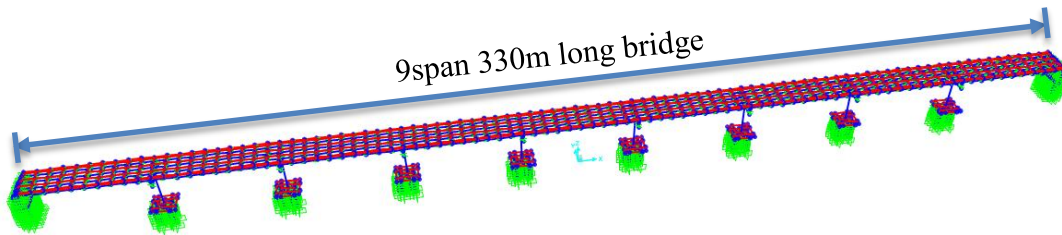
3D bridge model in SAP2000 founded on medium stiff clay
